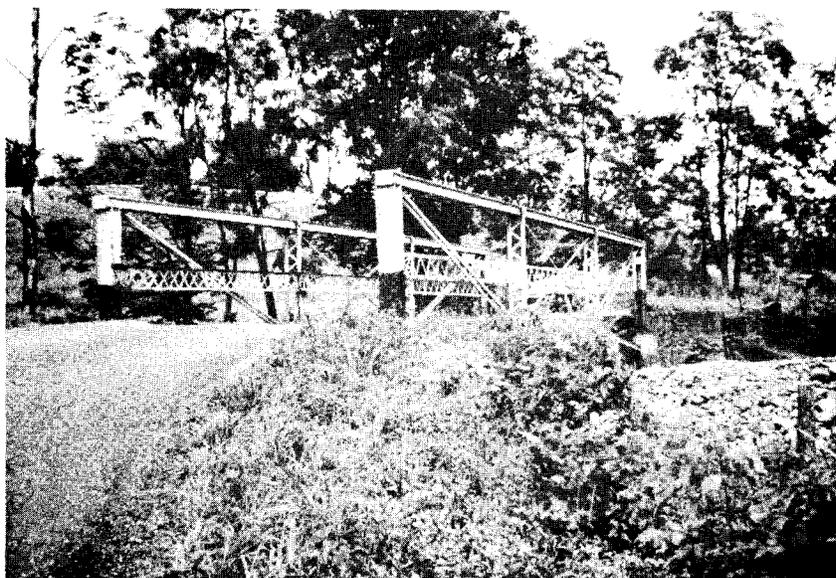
A typical low Bedstead/Truss Leg truss configuration with vertical end posts. (Augusta County; see form/photo number 08-07-15.)
